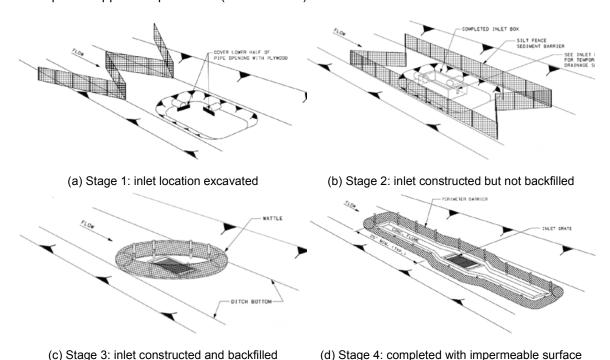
Standard ALDOT Installation Inlet Protection Practices (ALDOT 2012).
